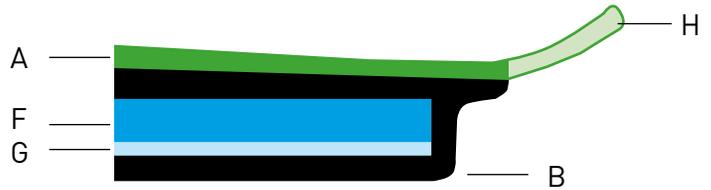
presents a cross-section of the edge of the covering shown in figures 2 and 4. The flexible plastic covering (H) extends beyond the reinforcing layer (F). The flexible edge section (H) can be lifted against the wall, or bent to fit the sloping surface at the edge of the concrete floor.
